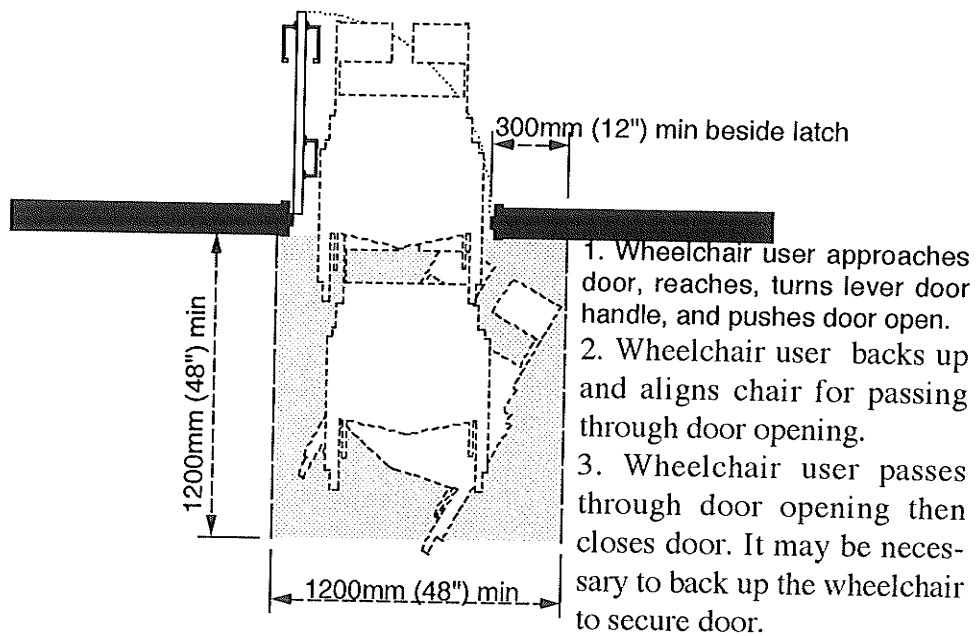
Minimum Doorway Maneuvering Space, Side-hinged Door, Front Approach, Push Side
